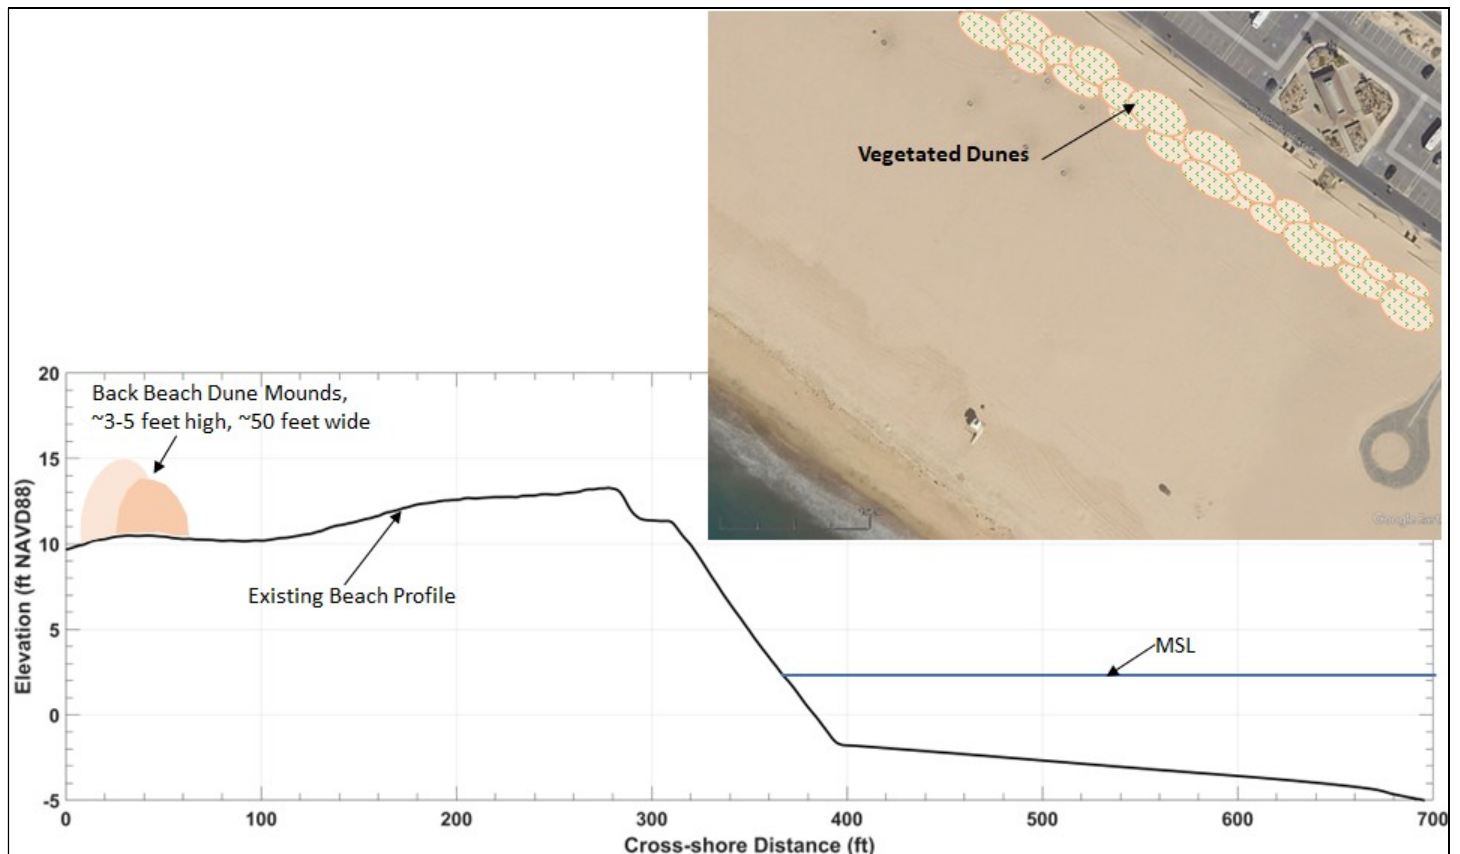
Backbeach Dunes Design Plan View and Cross Section
